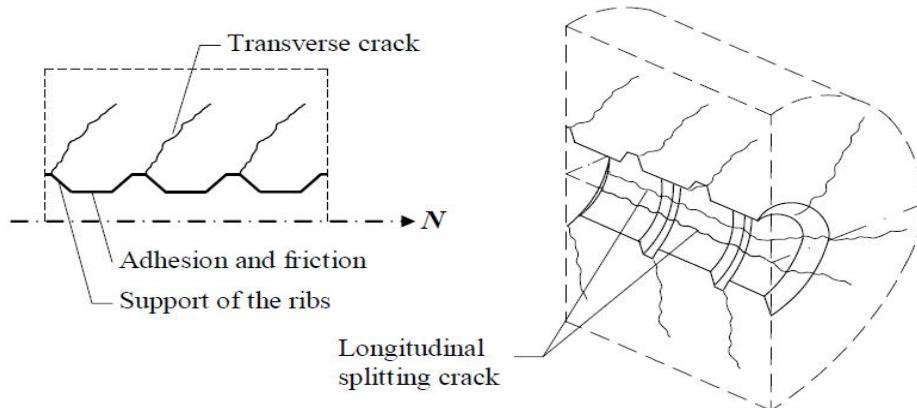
cracking caused by bond, modified by magmusson (2000) from vandewalle (1992).
